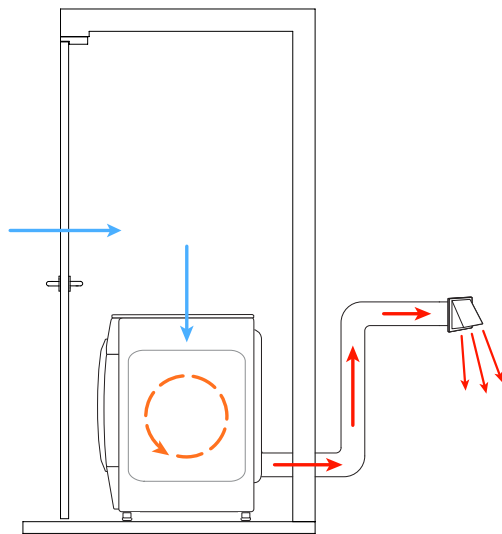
Schematic of Airflow through a Vented Dryer and Laundry Closet
